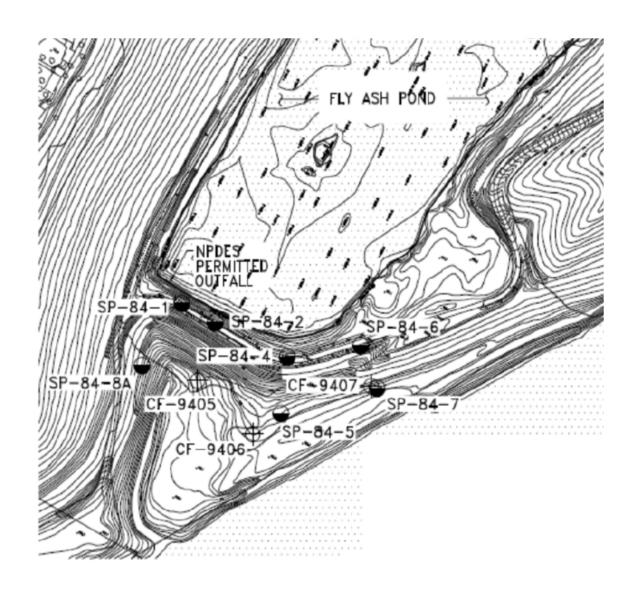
LANDFILL RUNOFF COLLECTION POND PIEZOMETERS LOCATION PLAN
